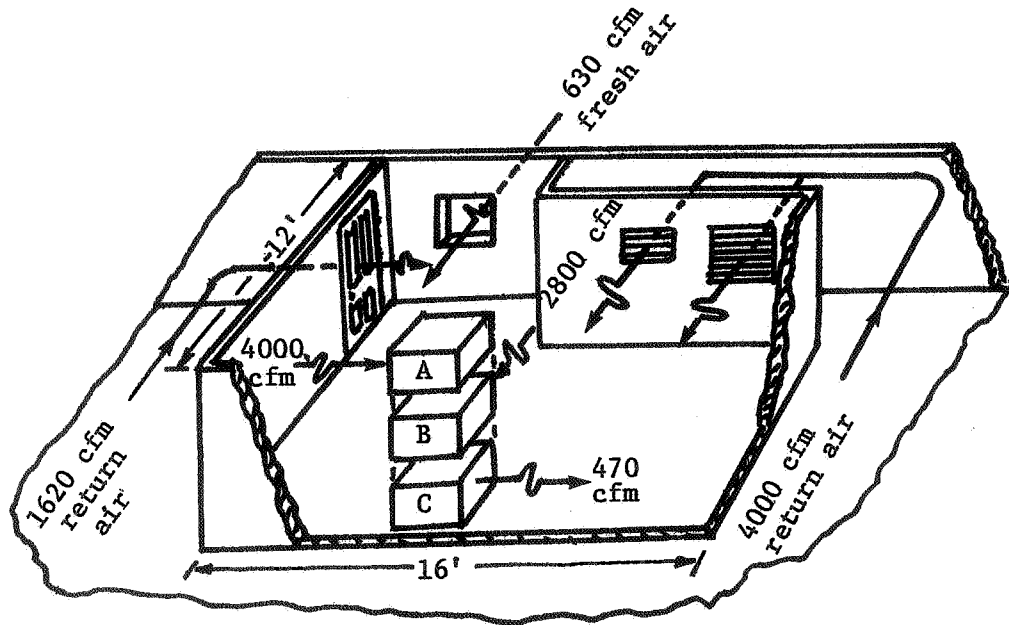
CUTAWAY VIEW OF MECHANICAL ROOM
